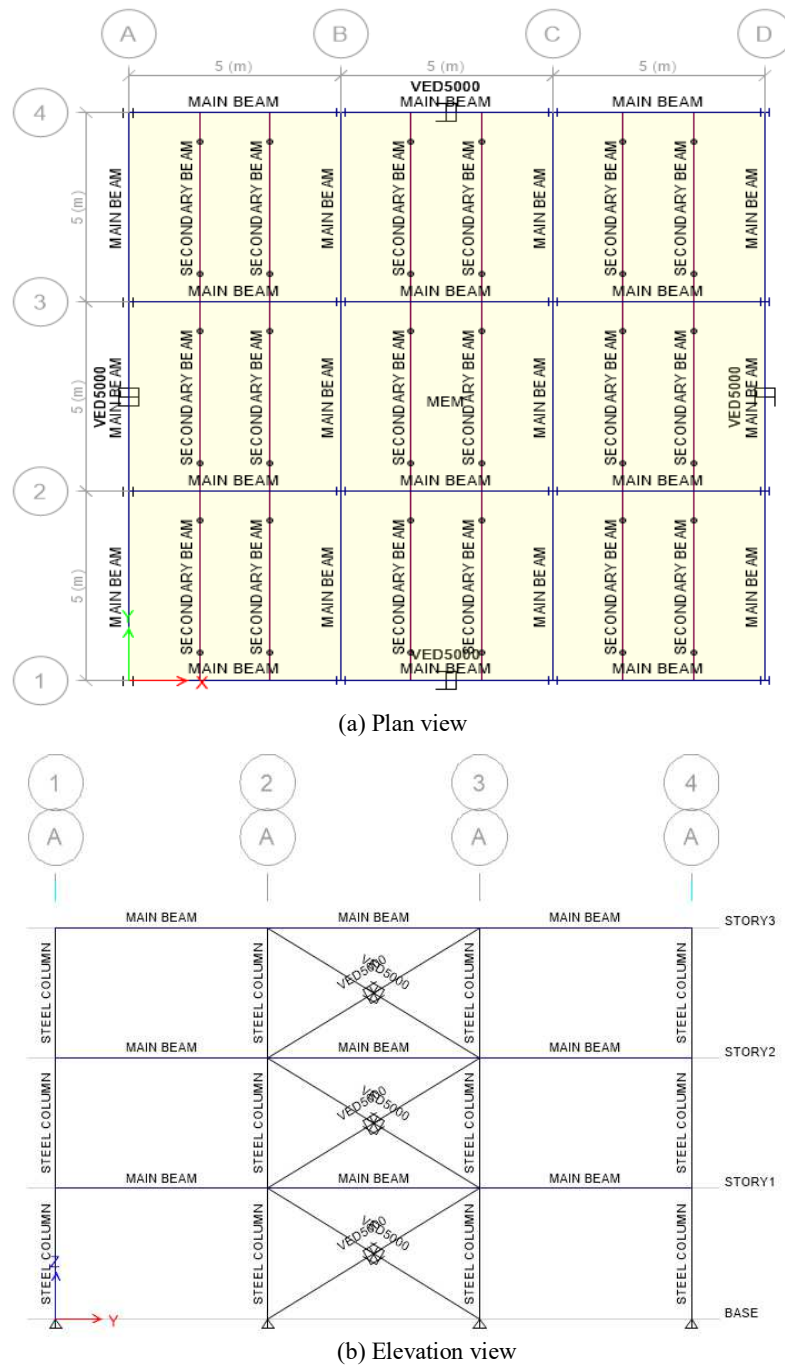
Viscoelastic damper location in plan and elevation of ordinary moment resisting steel frame building in the outer frames.
